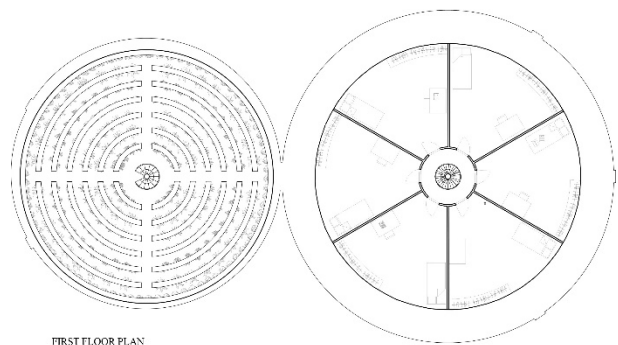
Interior Layout Second Floor (Source: Magda Borovina)
